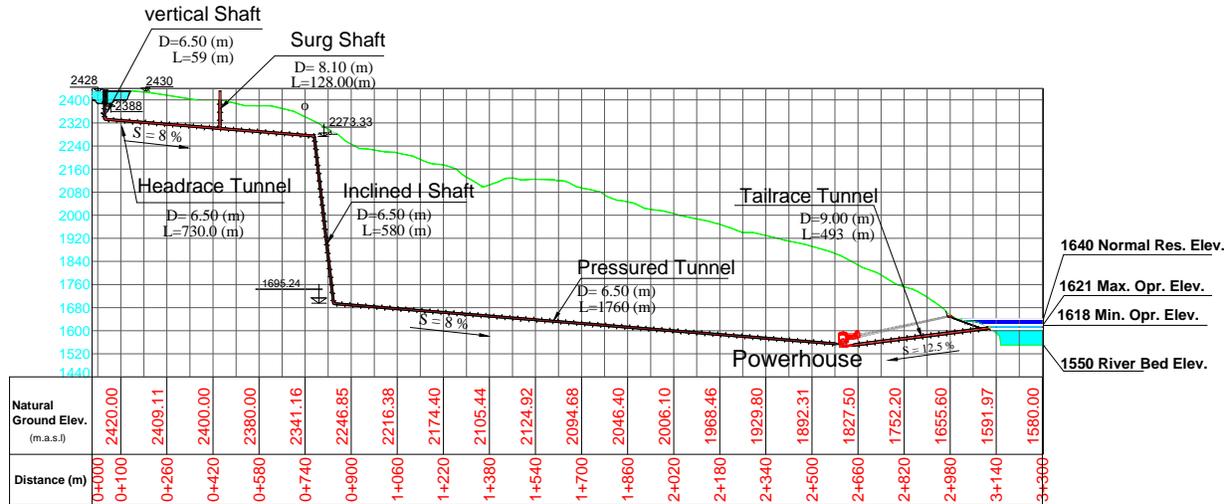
Longitudinal Section of Mirabad pumped Storage Hydro Power
